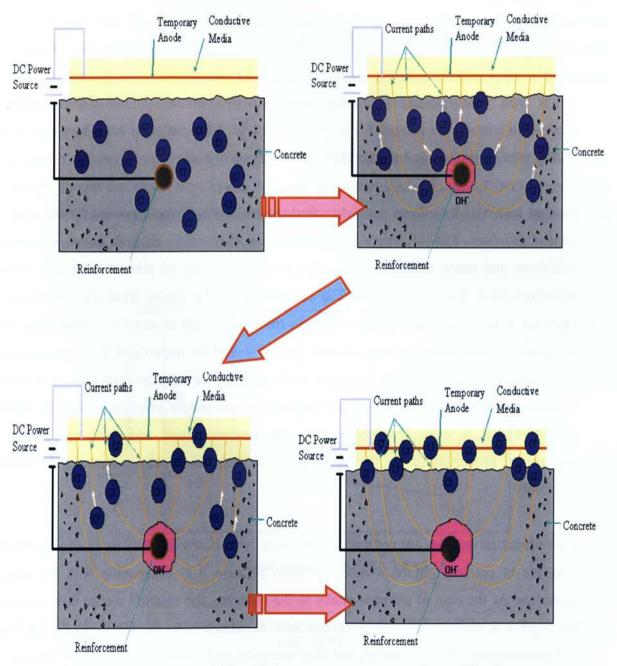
Extraction of chloride ions to temporary anode outside of concrete
